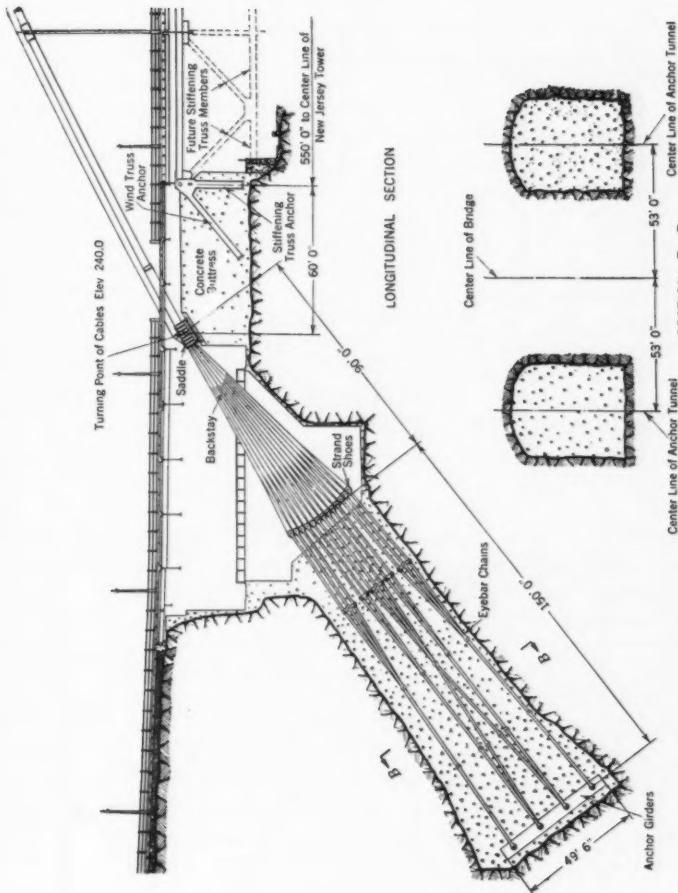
LONGITUDINAL SECTION A-A, NEW JERSEY ANCHORAGE (SEE, ALSO, FIGS. 7 AND 9).
